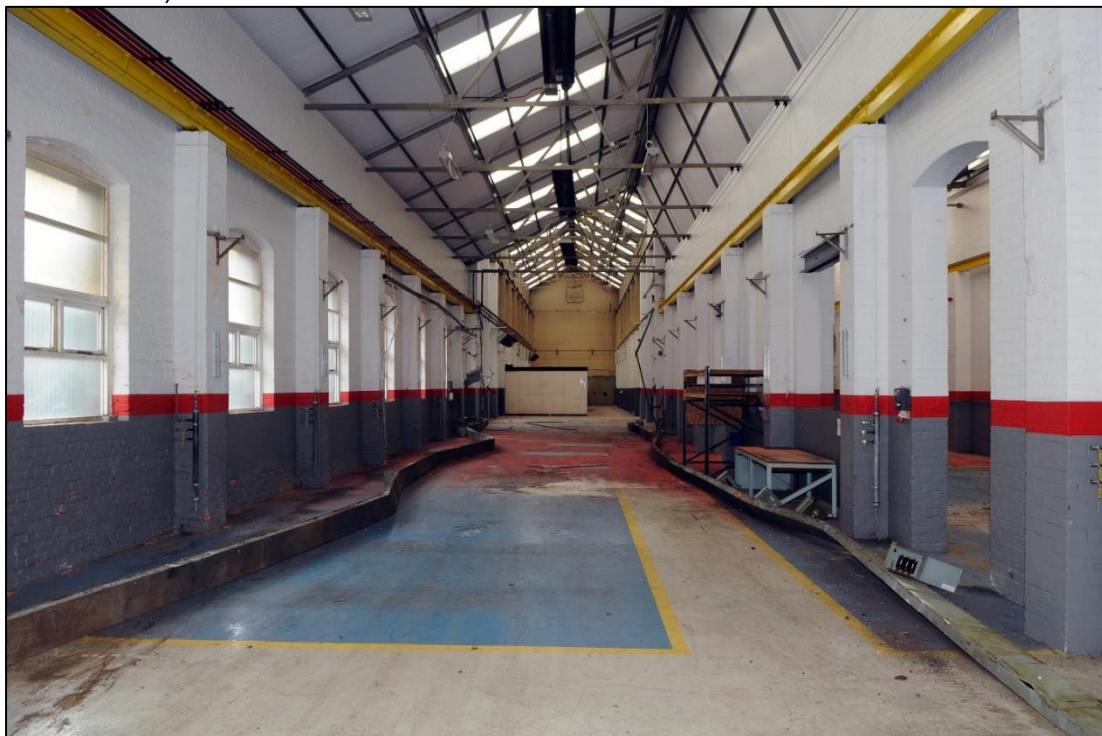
View facing south along the north-light range, adjacent to the western range of Building 4 (image 0011).
